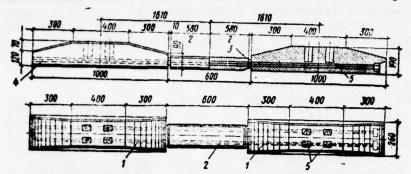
Double-hinged, double-bundle reinforced-concrete slab
